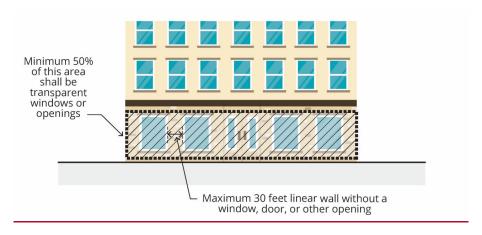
F MIXED USE BUILDINGS, NONRESIDENTIAL USES: BUILDING TRANSPARENCY/REQUIRED OPENINGS
